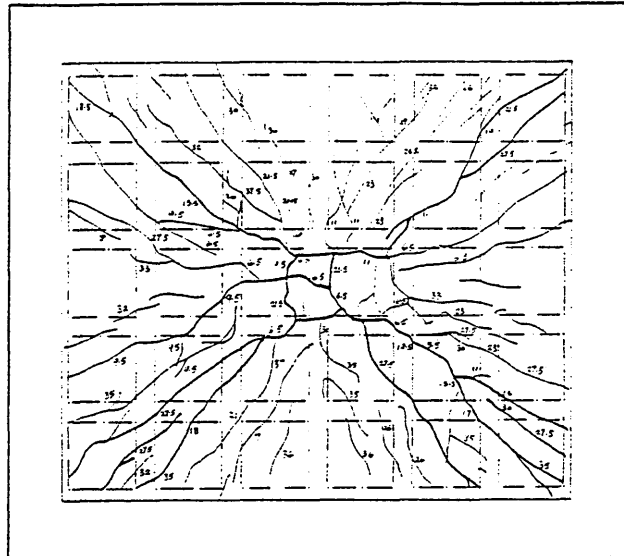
Failure Crack Pattern of R.C.Solid Model Slab D1
